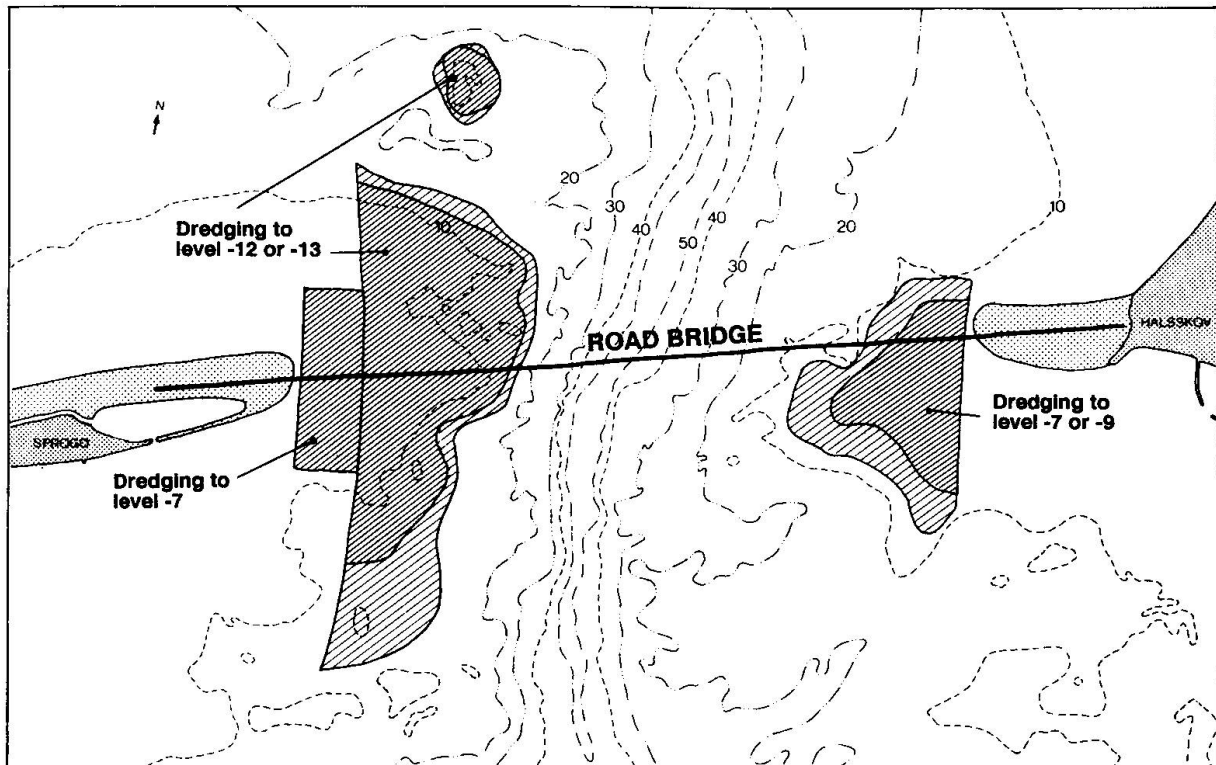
A calculated example showing the extent of a dredging/excavation possibility for a road bridge and a railway tunnel in the Eastern Channel combined with the Western Bridge in alternative designs.
